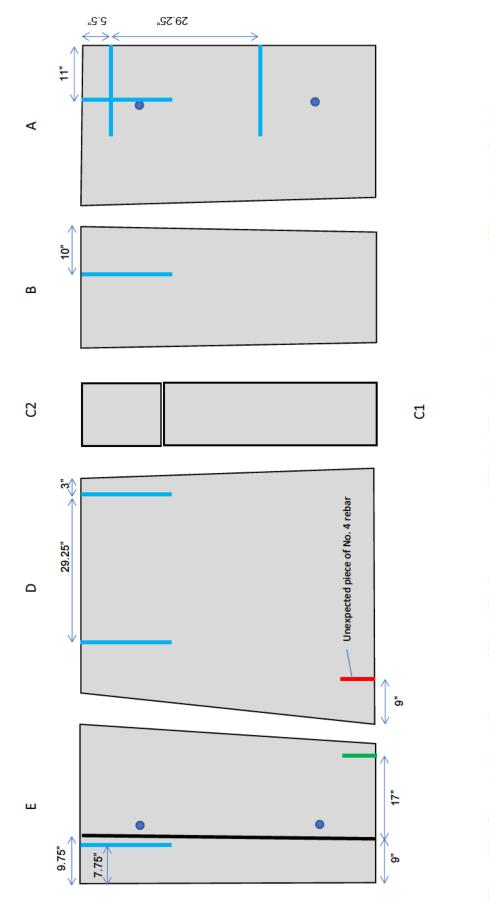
(cont.): Slab 4 pieces positioned in a manner in which they were located in the slab prior to fracture. (c) View of the north cut face.
